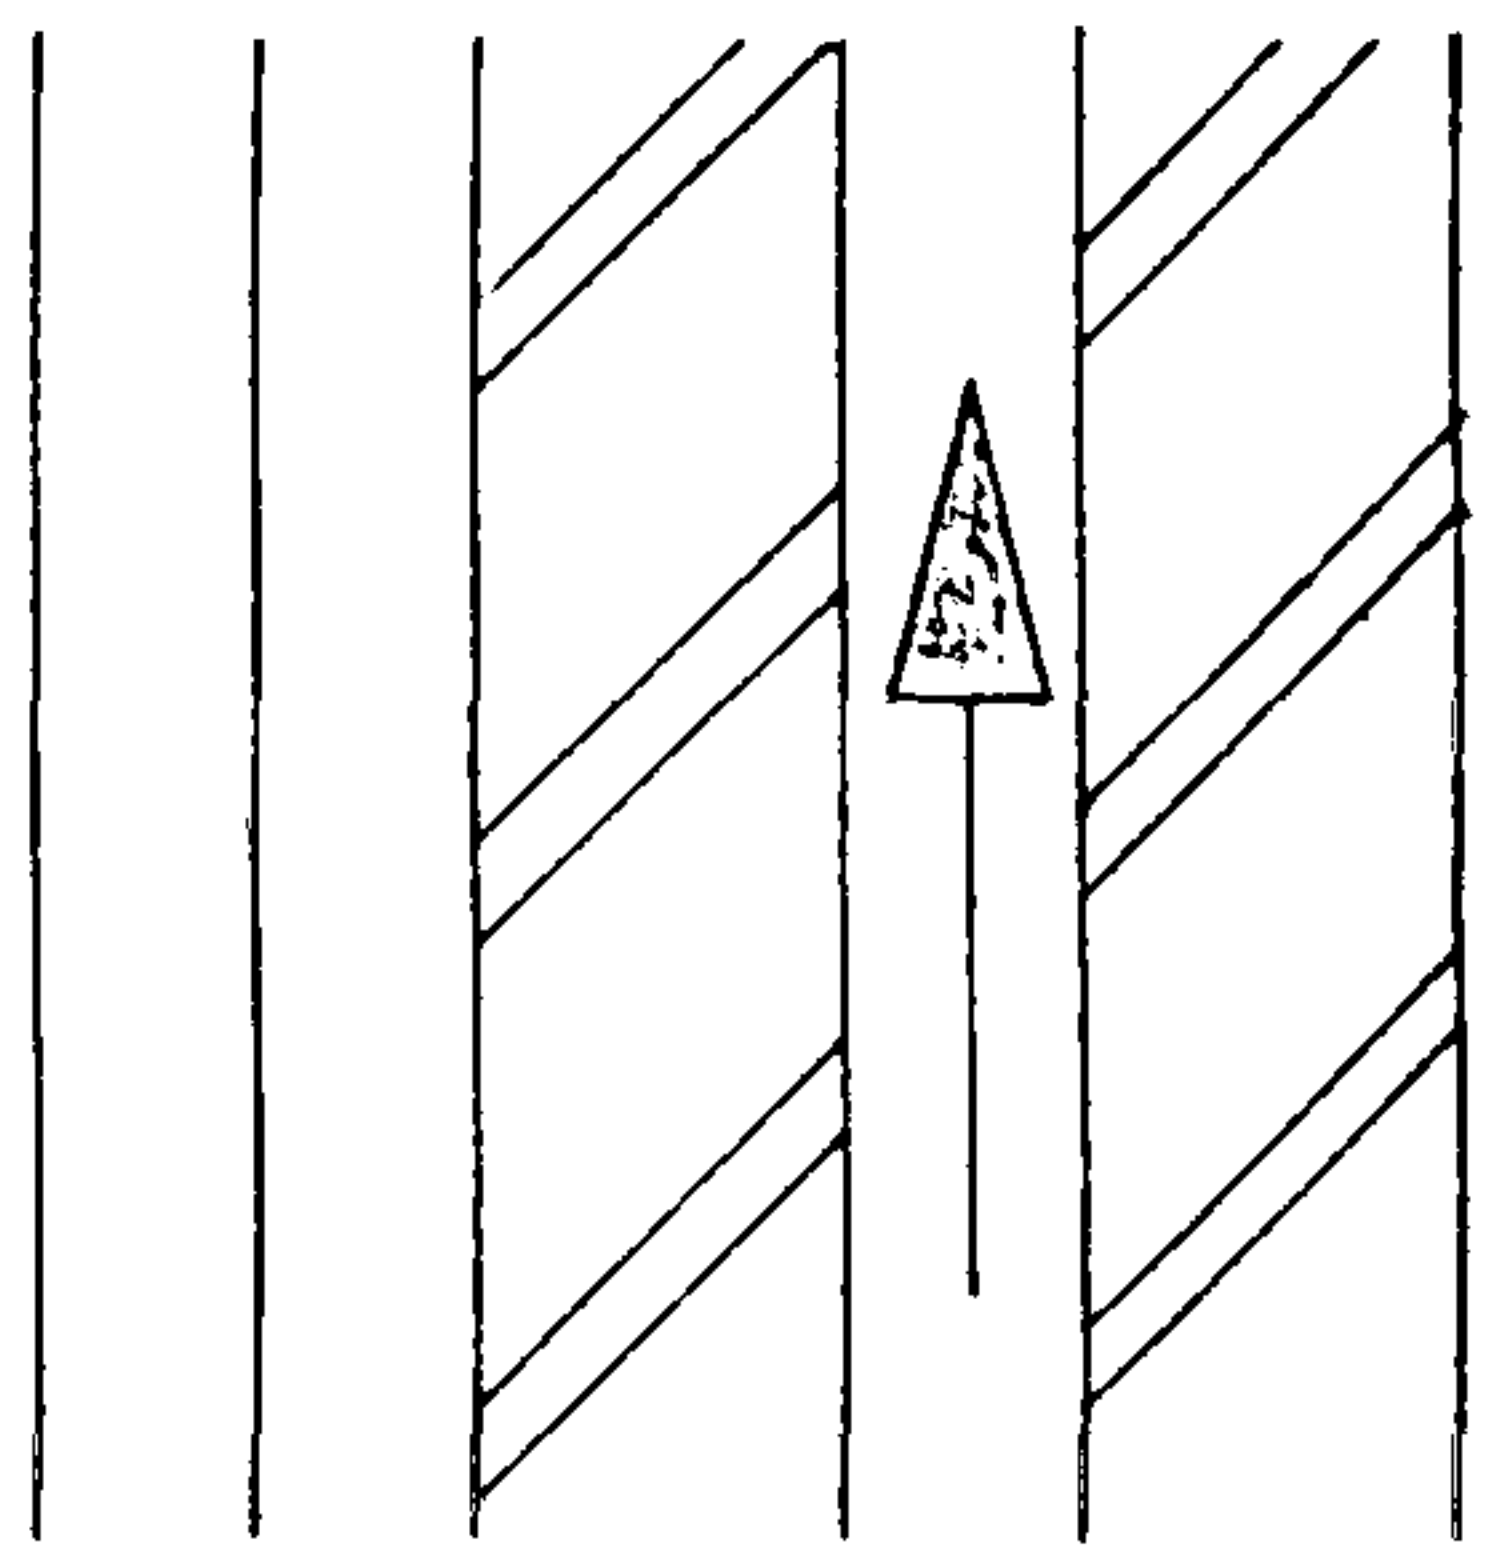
CAVITY BRICK WALL: HEAT MIRROR GLAZED AIR
